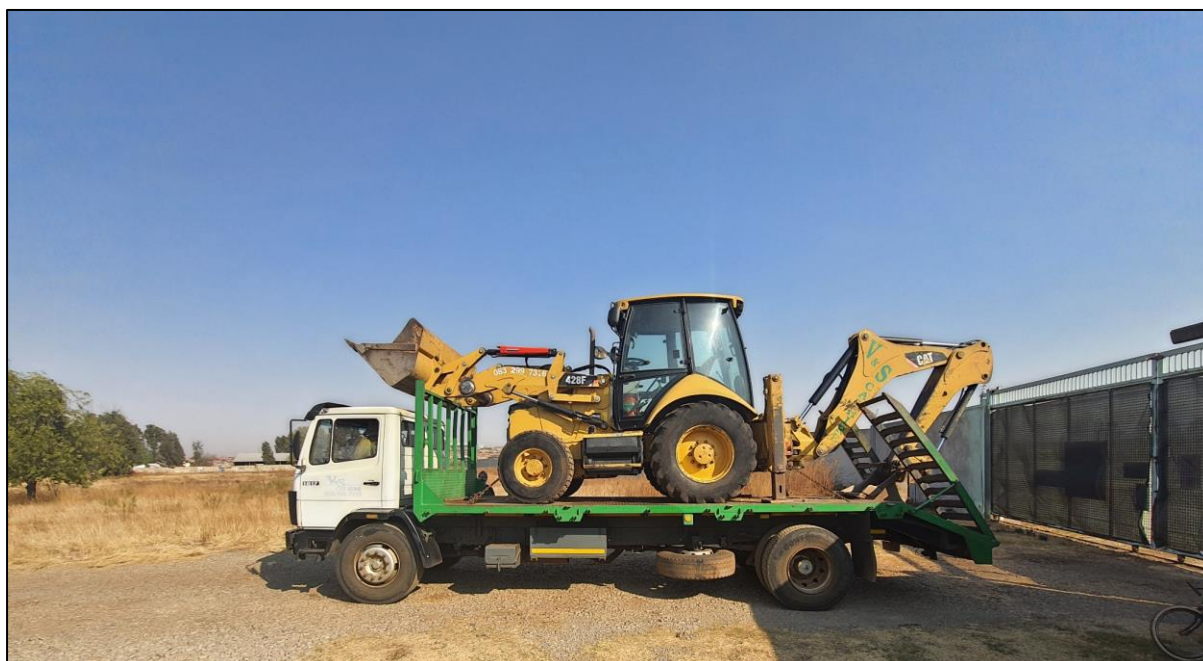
View of TLB equipment used for excavation of test pits.
